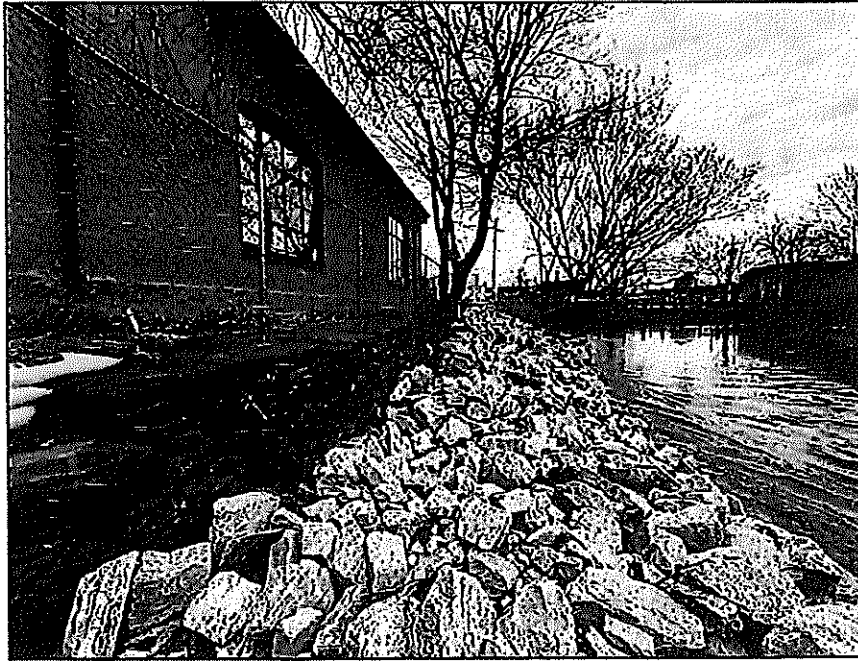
Masonry portion of channel wall near 0+50 looking upstream
